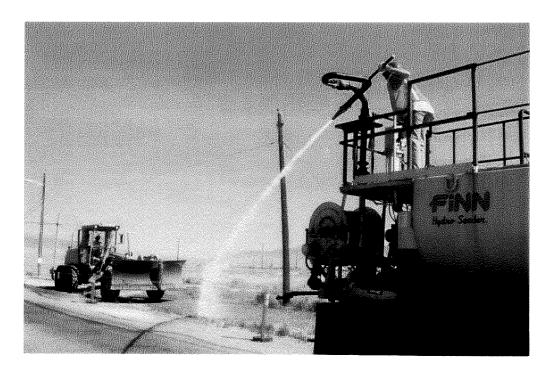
Water being applied to the TSF-06 Area B site prior to excavation of contaminated overburden, June 2000.
